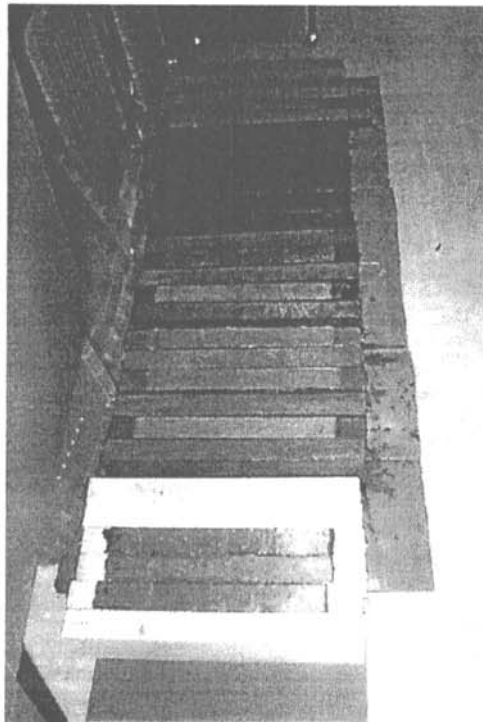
All submerged RC concrete specimens prepared for testing.
